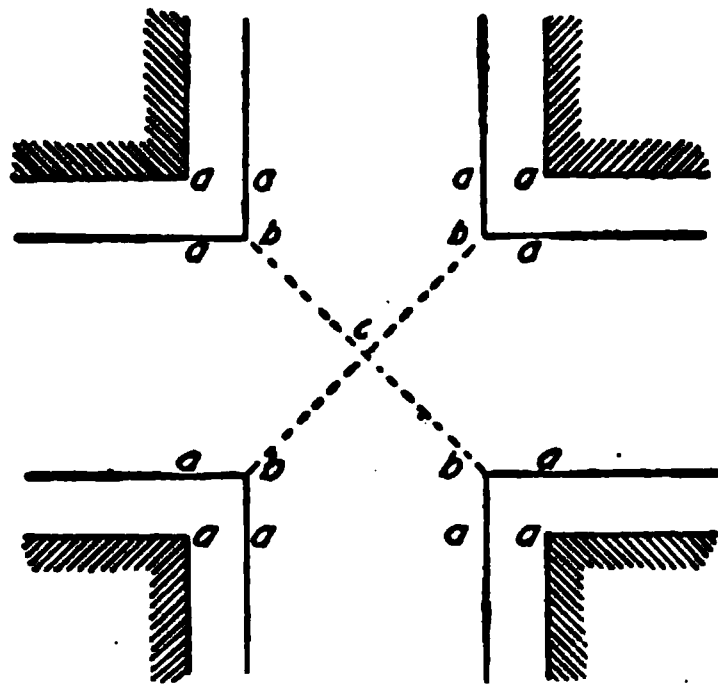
GRADE AT LEVEL STREET INTERSECTION.
